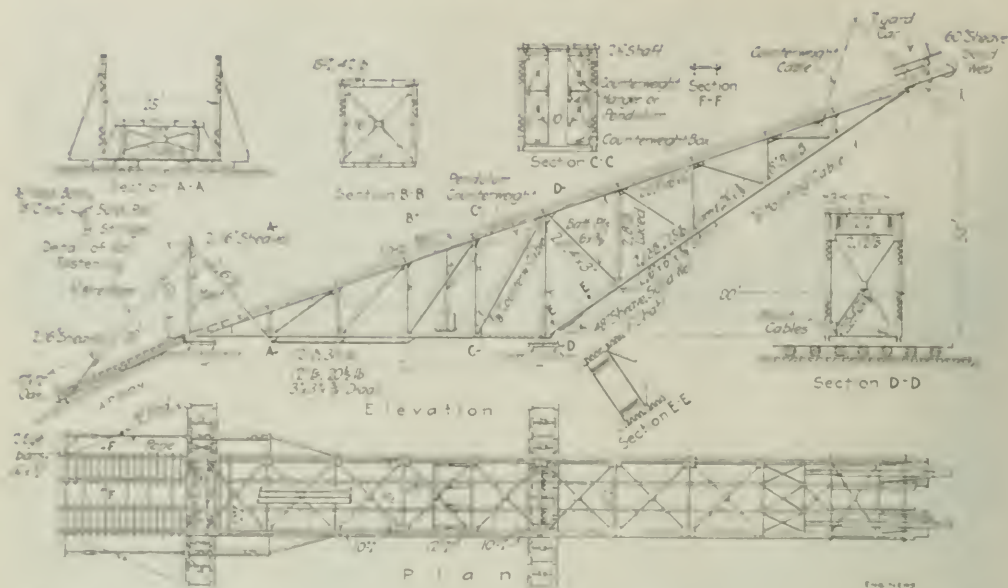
DETAILS OF TRAVELING CANTILEVER DUMP OR TITTL, SHOWING THE DUMPING PLATFORM AND THE APPROX. EXTENDING INTO THE CANAL EXCAVATION
